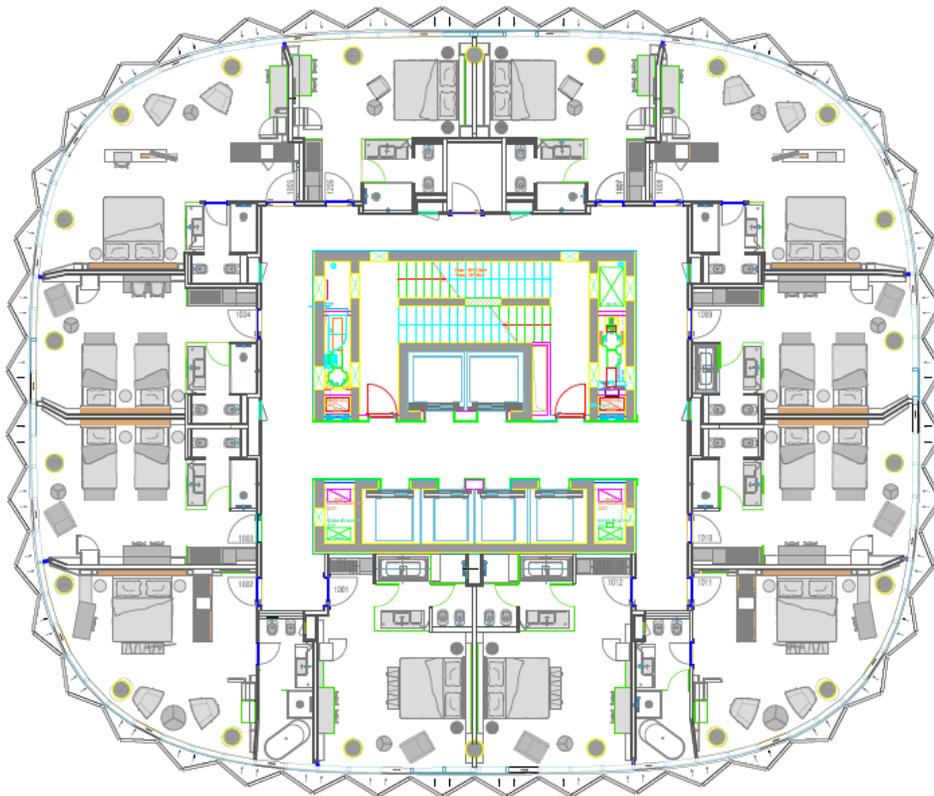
Typical layout of the guestroom floor, 9th floor [TID archive, 2016]
